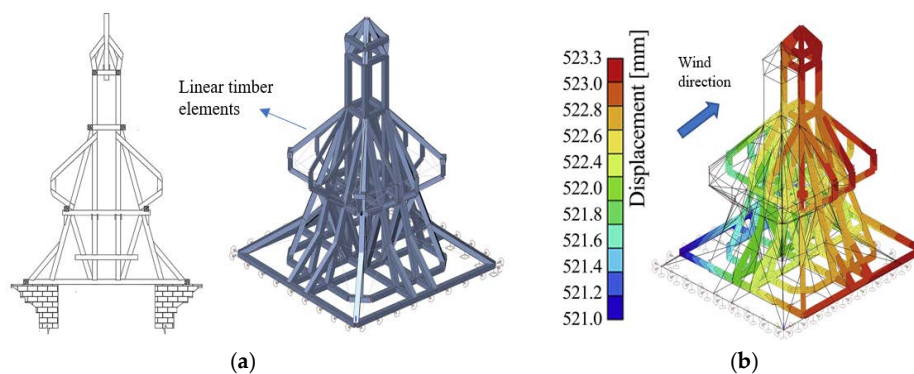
(a) Linear numerical modeling of a timber roof; (b) Displacement of each part of the timber roof subjected to wind load by considering the sliding support between the timber roof and the lower level masonry structure. Reprinted from [123].
